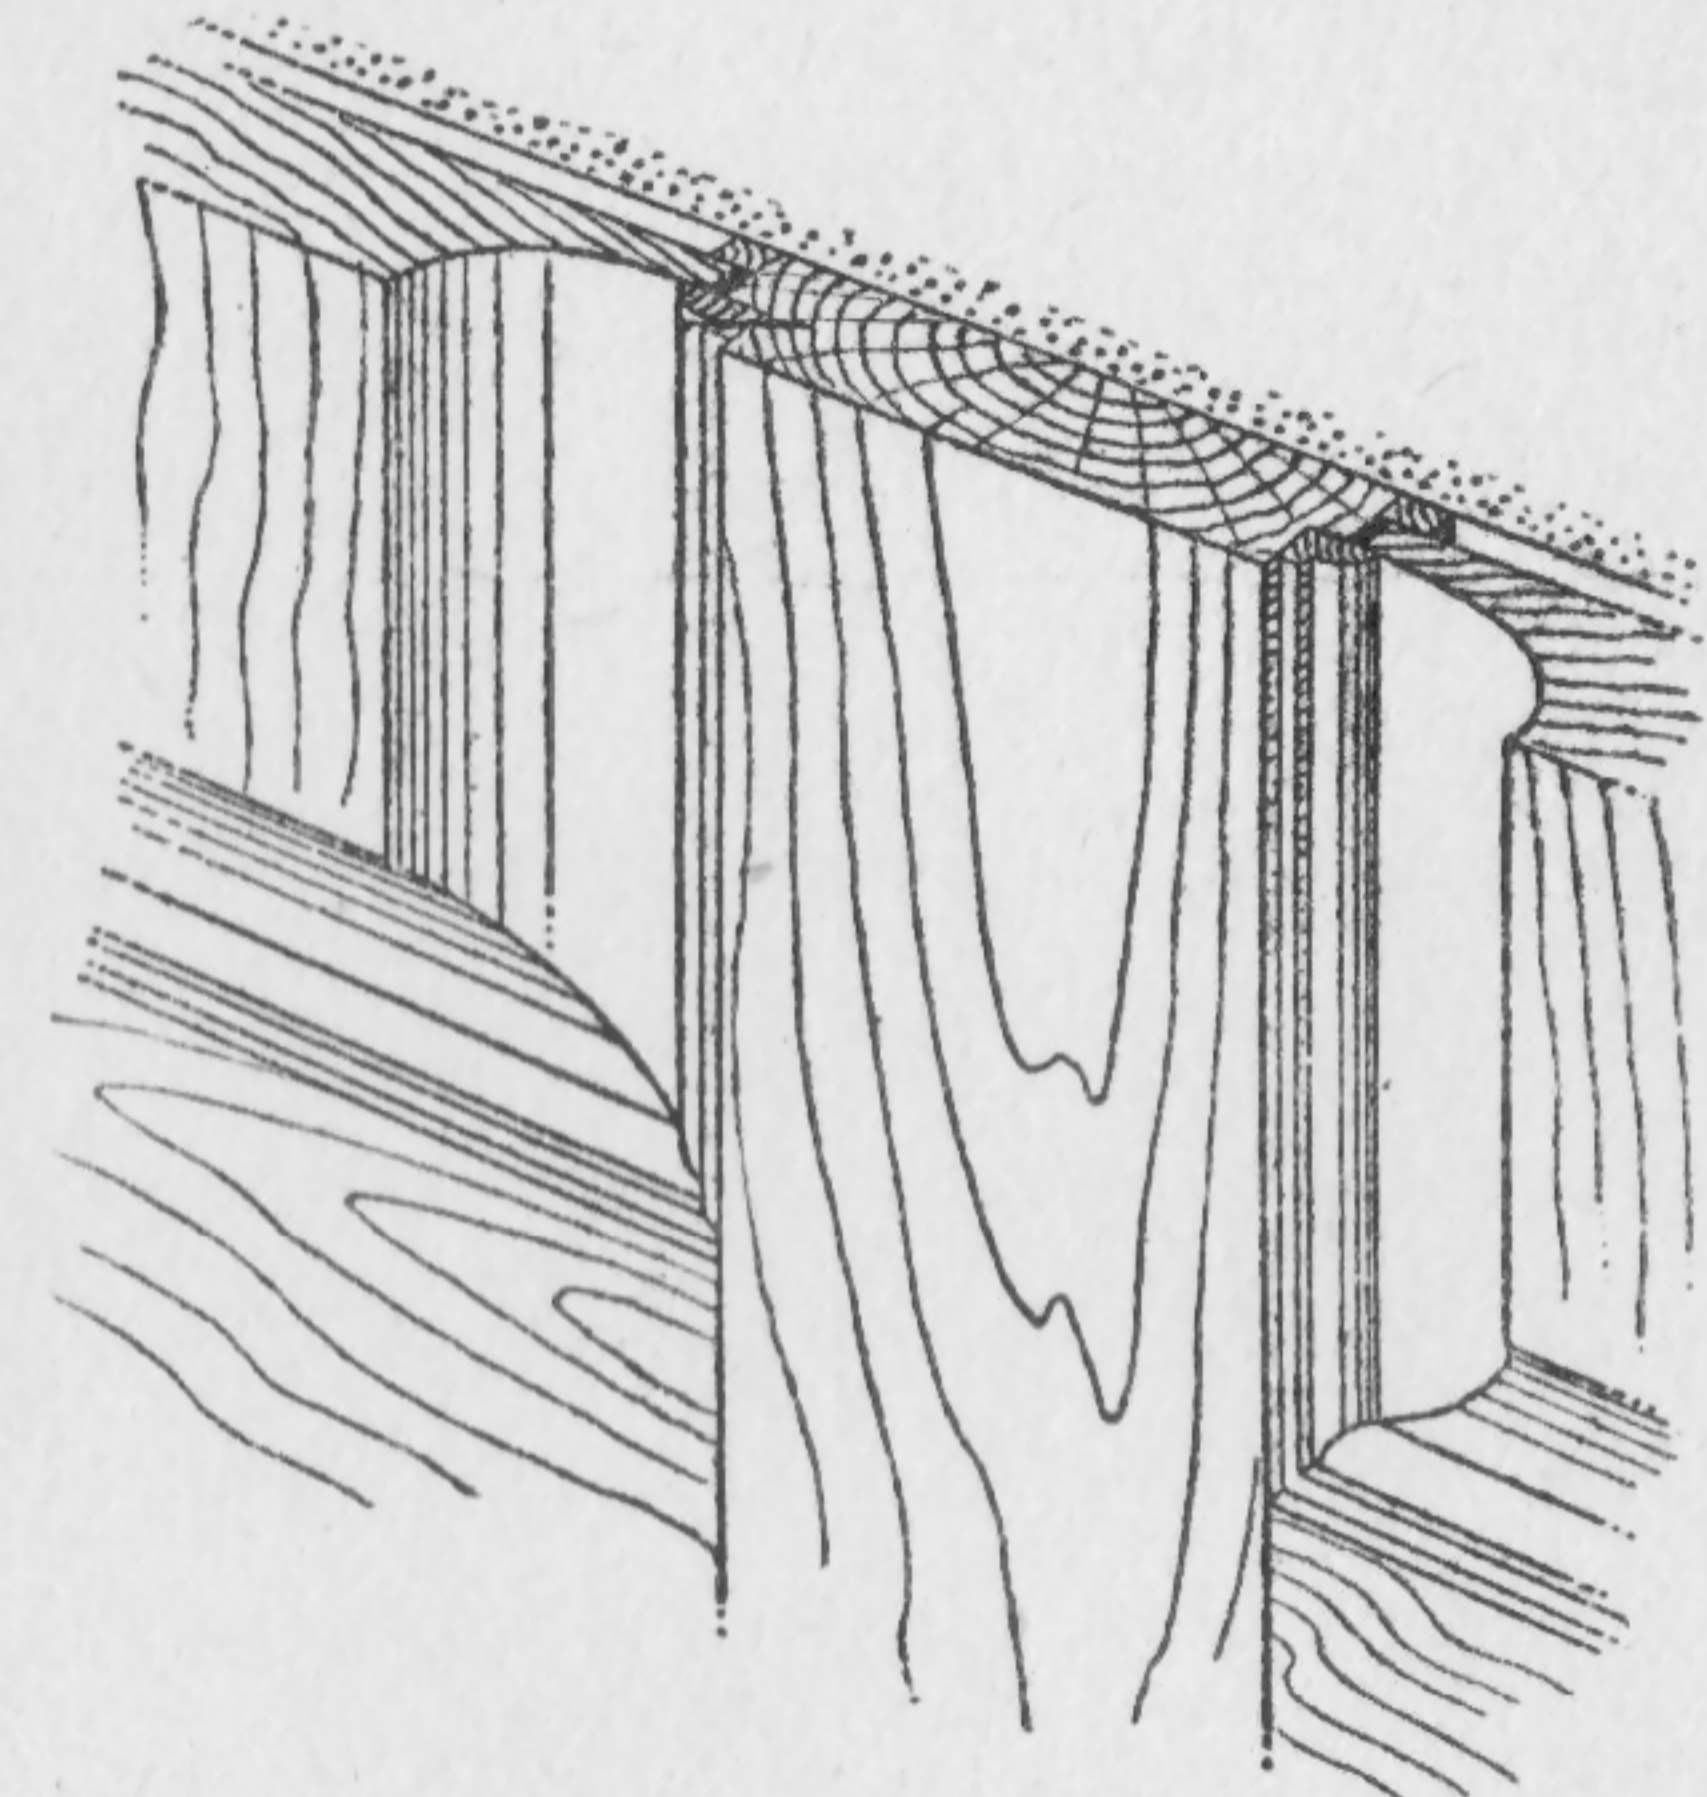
A horizontal cross-section through paneling set against a plaster wall.
